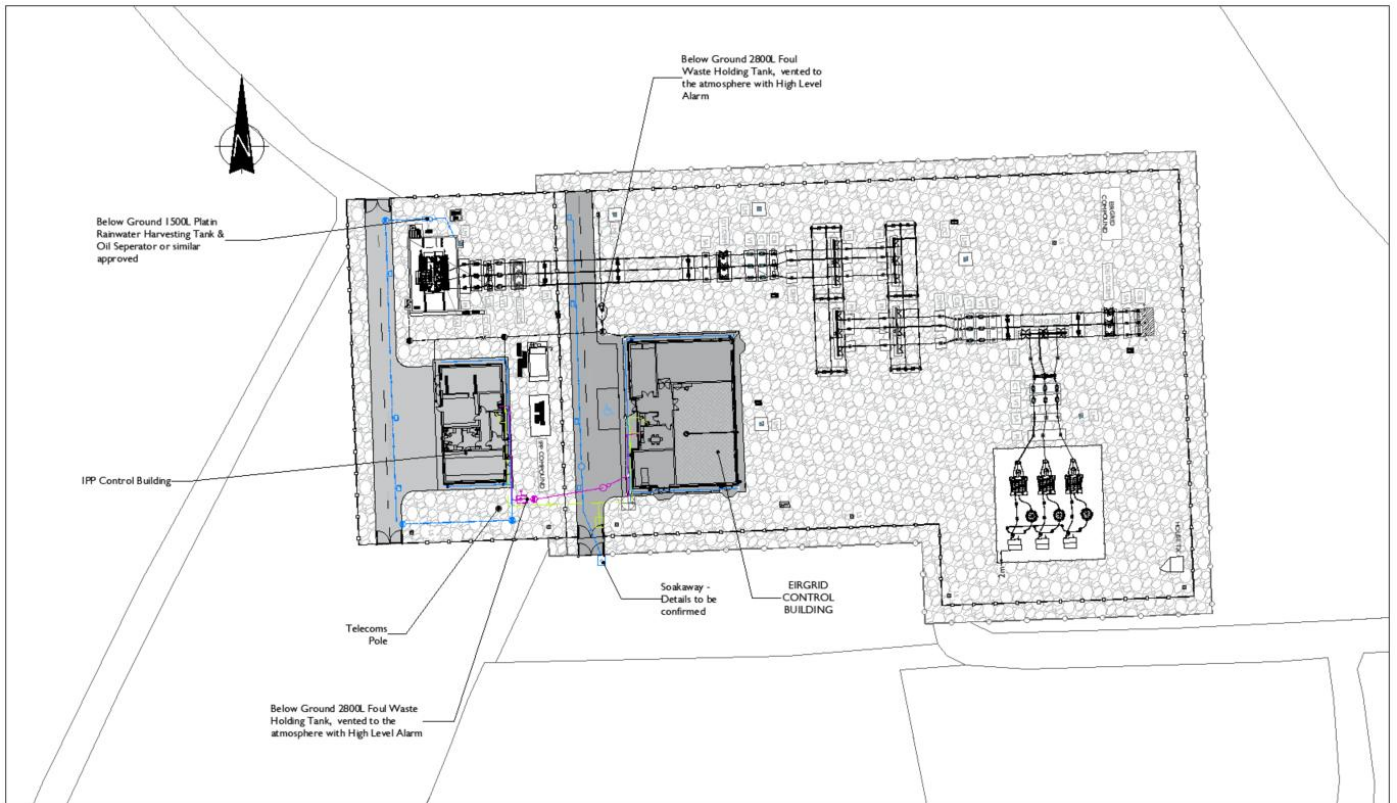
Proposed Cahermurphy West 110kV Substation Infrastructure Layout Plan
